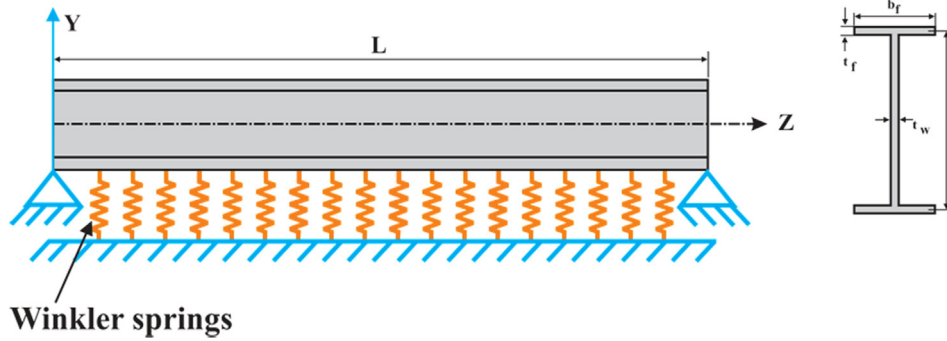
Doubly symmetric Thin-walled I-beam resting on Winkler foundation.
